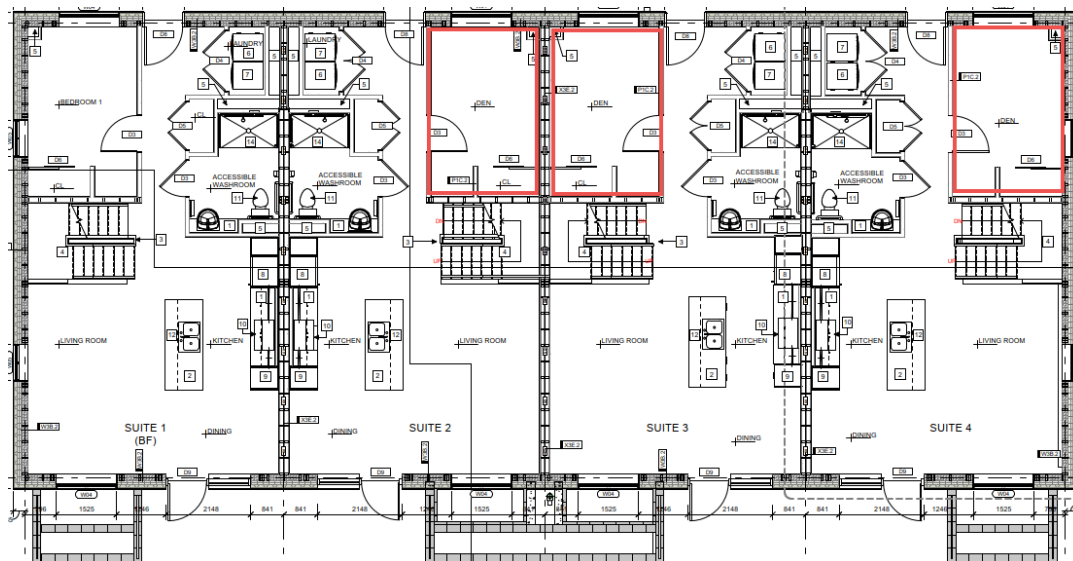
Excerpt of the Ground Floor Reference Plan for 58 Capilano Drive. The existing Den is outlined in red (Source: CSV Architects).
